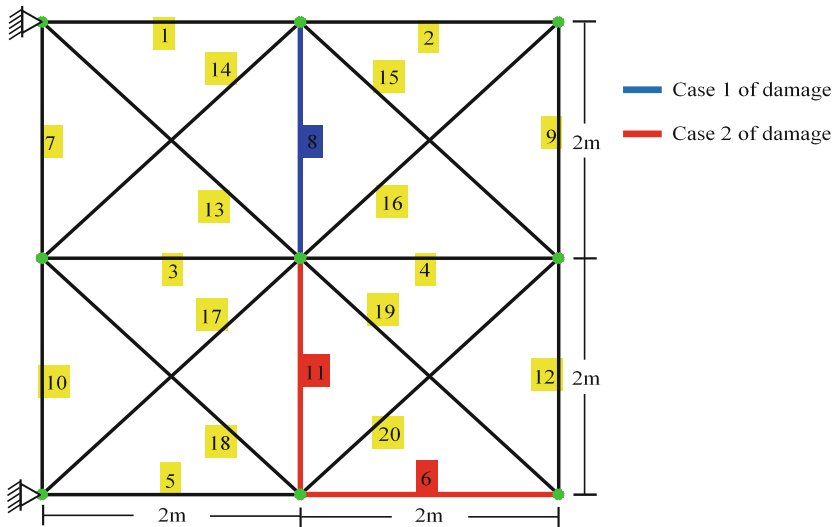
20-Bar planar truss with two scenarios of damage.
